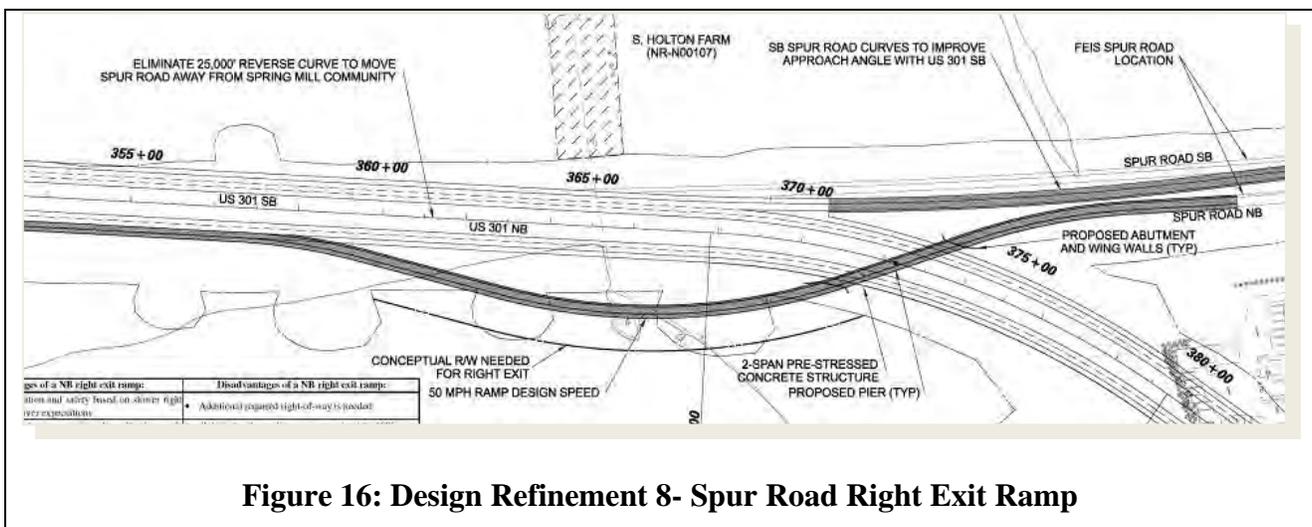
Design Refinement 8- Spur Road Right Exit Ramp
